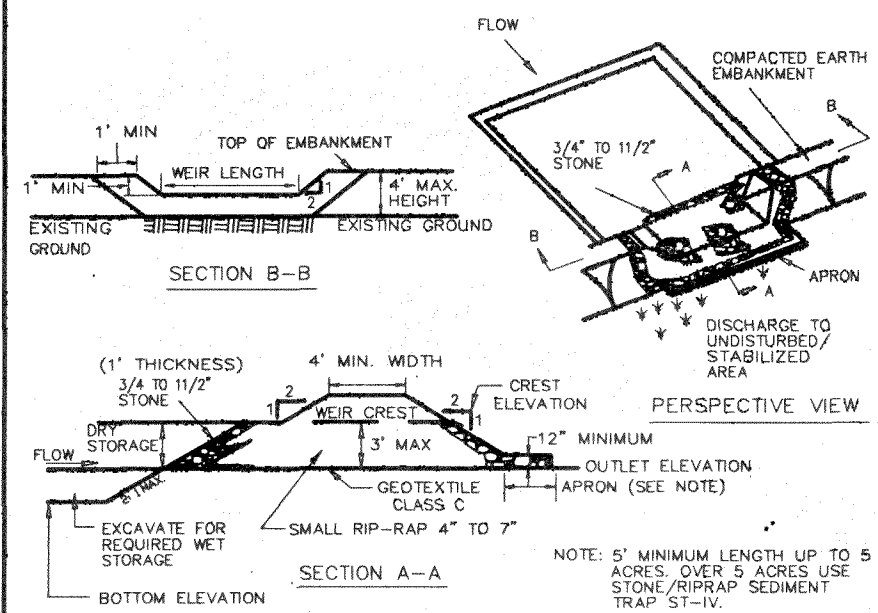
STONE OUTLET SEDIMENT TRAP - ST II
